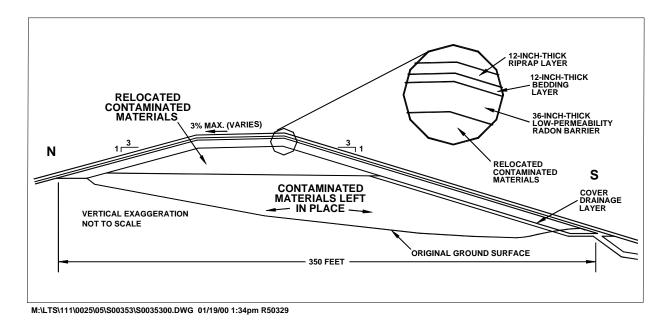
North-South Cross Section of Burrell Vicinity Property Disposal Site
